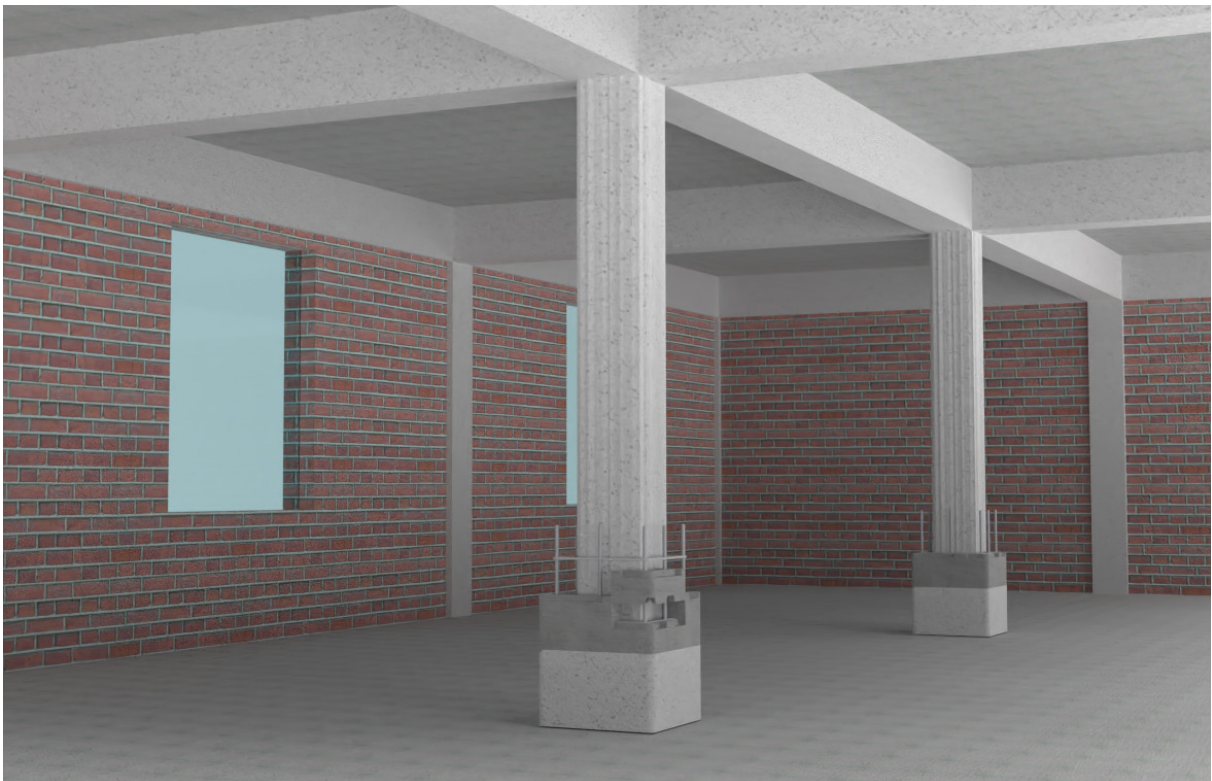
Step 5: In the next step, the bottom mould is placed around the column by fastening two identical halves of the steel together to form the formwork of the cast-in-place bottom. This provides the more reliable concrete bottom at the more stressed areas of the column, namely at its joints.
